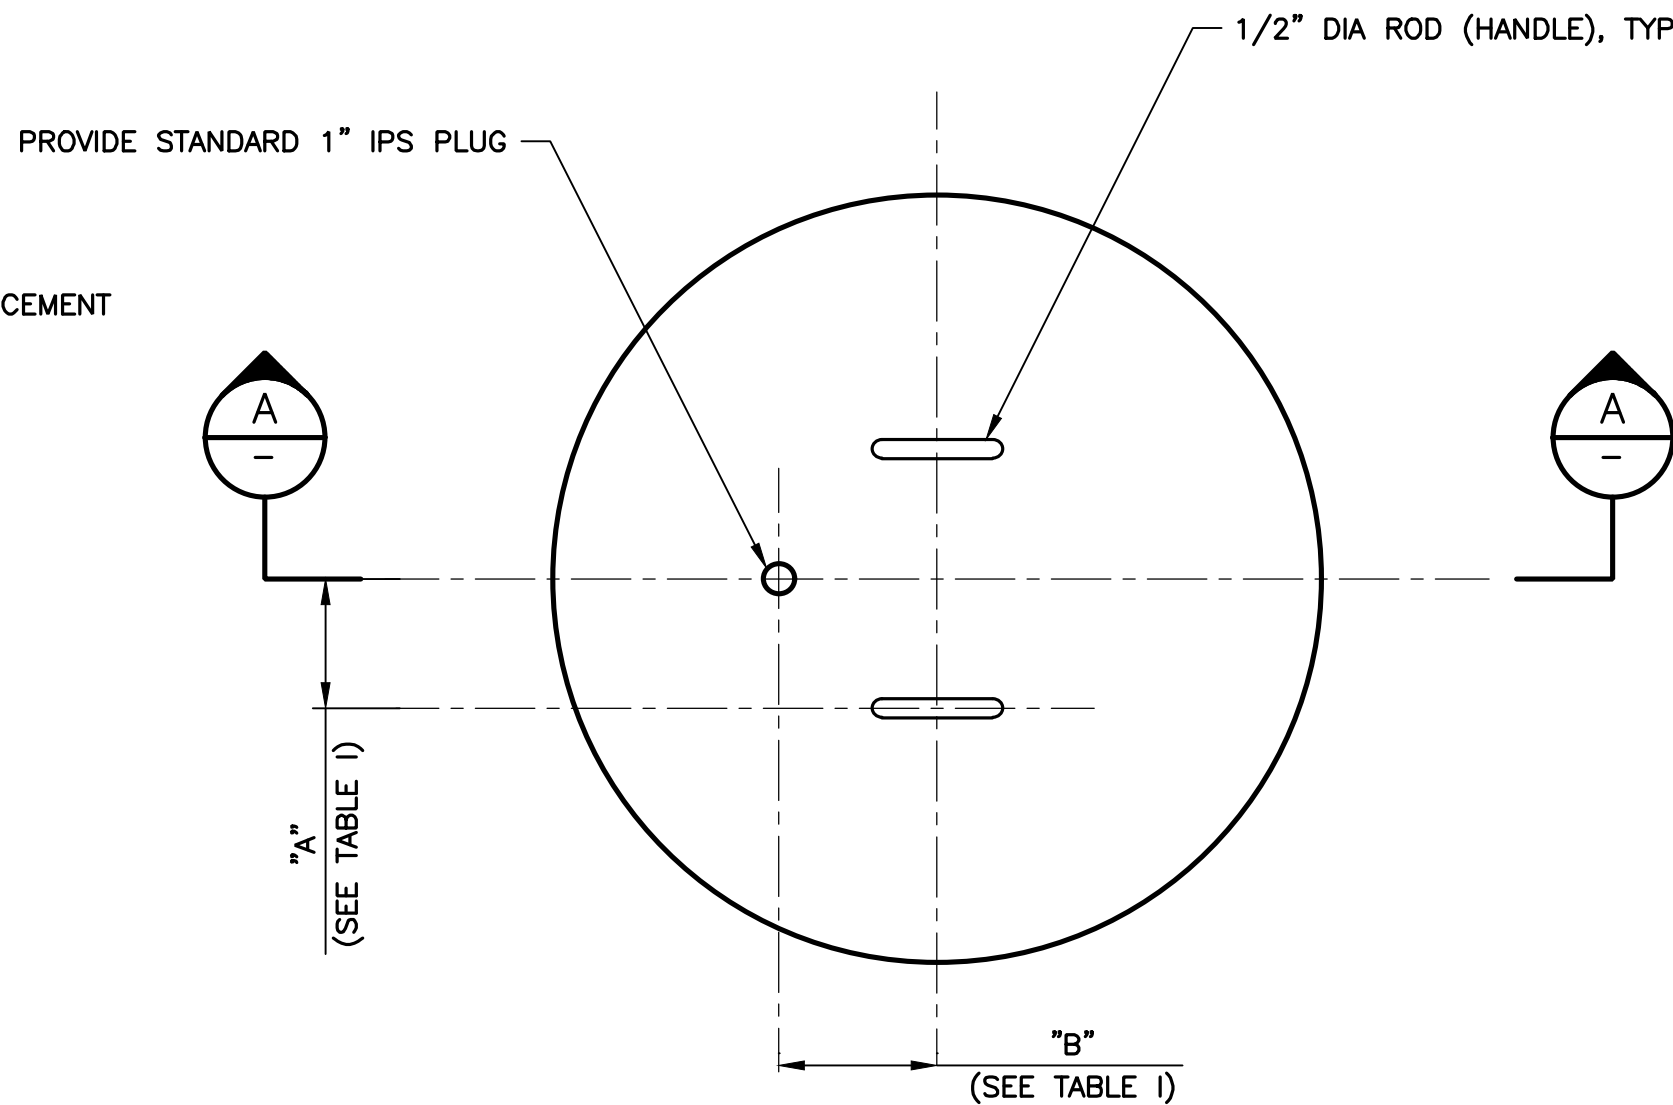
OUTLET FITTINGS - STEEL PIPE
